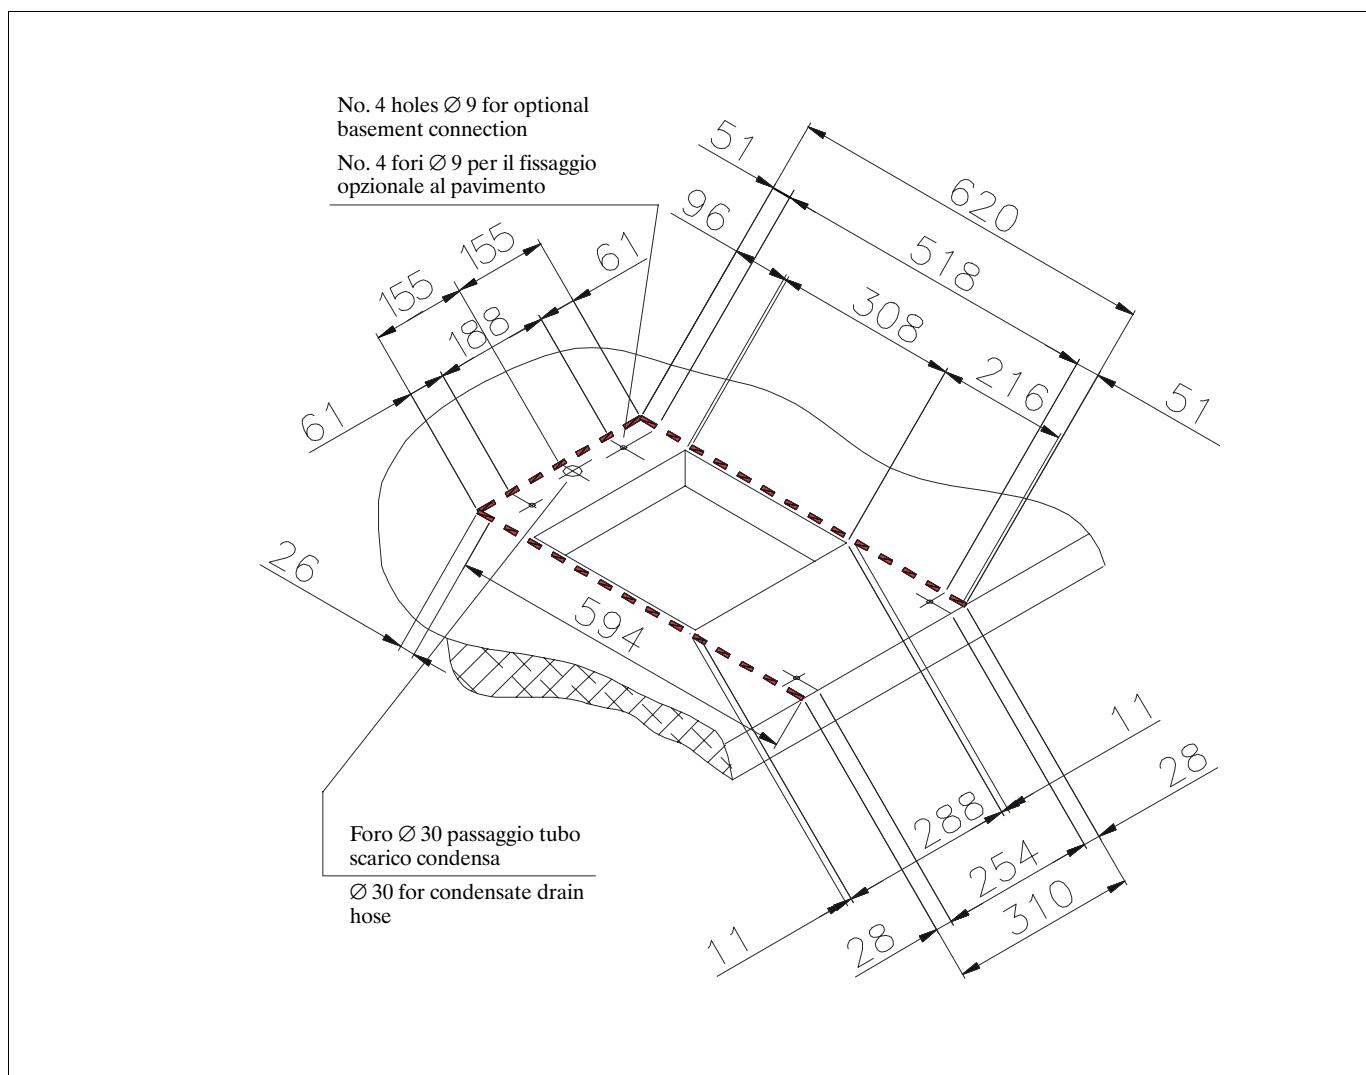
Optional basement connection / Fissaggio opzionale al pavimento
